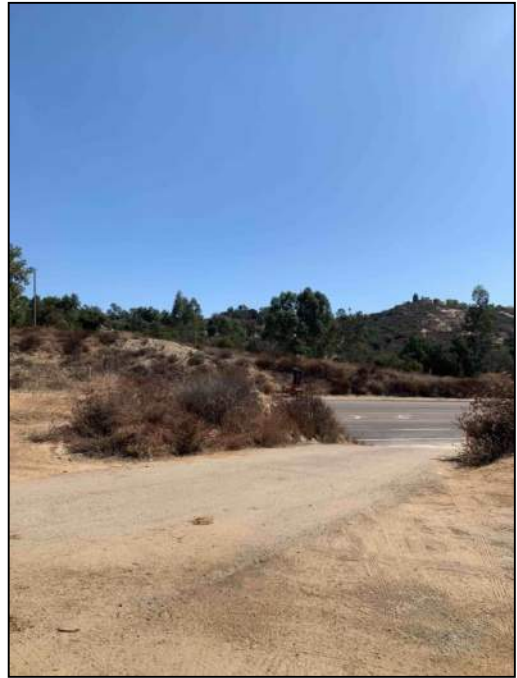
Area near tunnel alignment on Calle De Vista.
